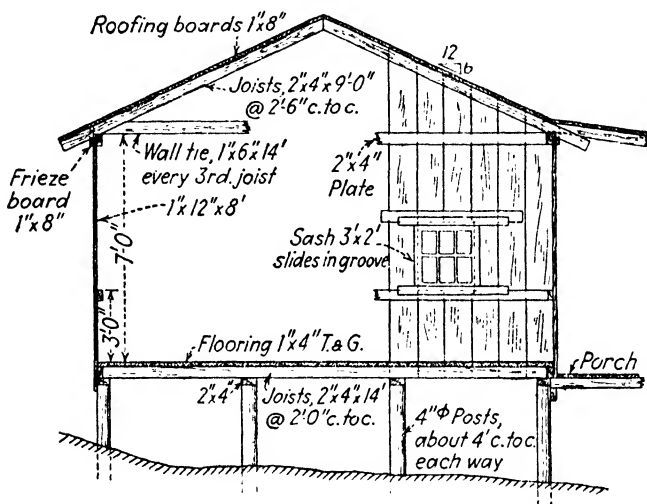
Details of simple job shanty, suitable for office, warehouse or bunkhouse.
